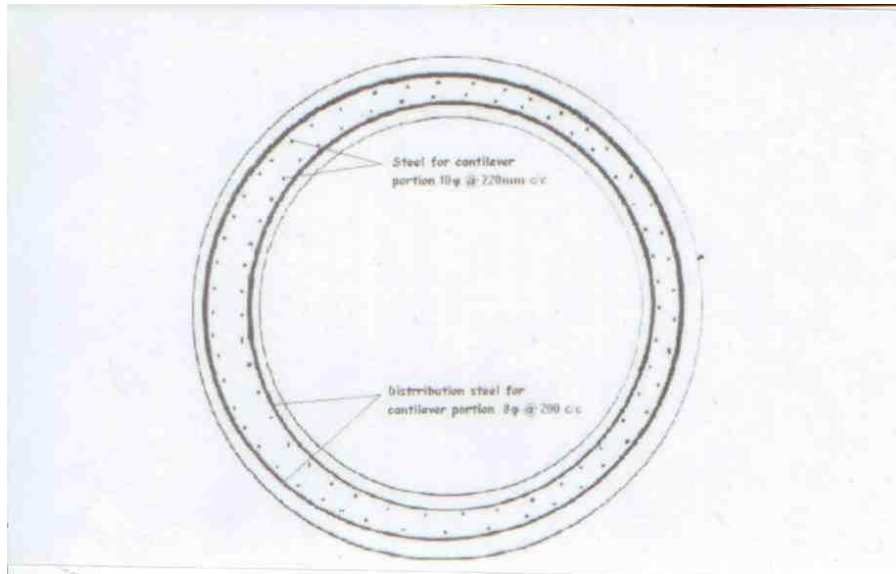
Reinforcement details of the Wall (Bottom cantilever part)
